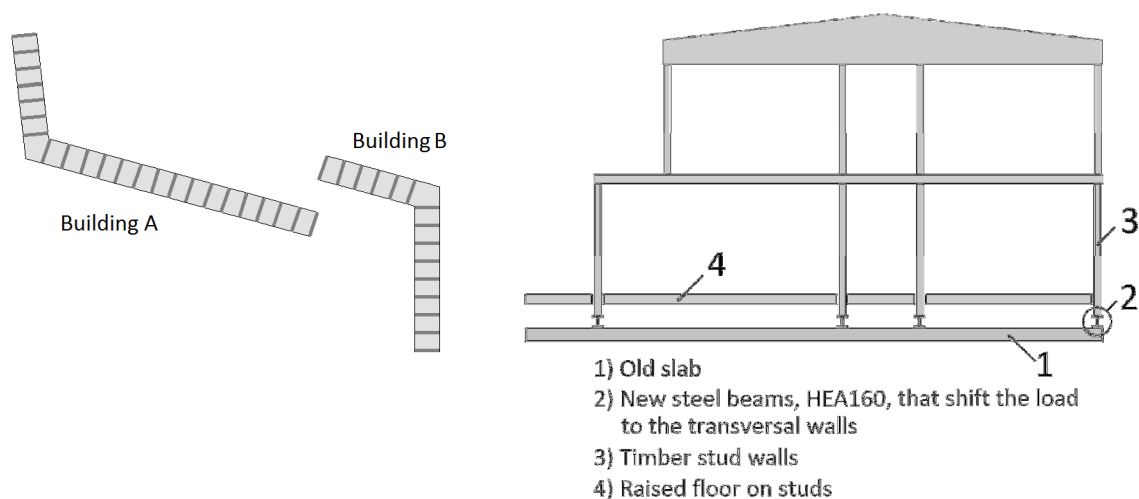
, Illustration of the buildings at Glasmästaregatan; a) rough sketch of the two buildings with load-bearing transversal walls, b) sketch of the load-bearing system for the extension.
